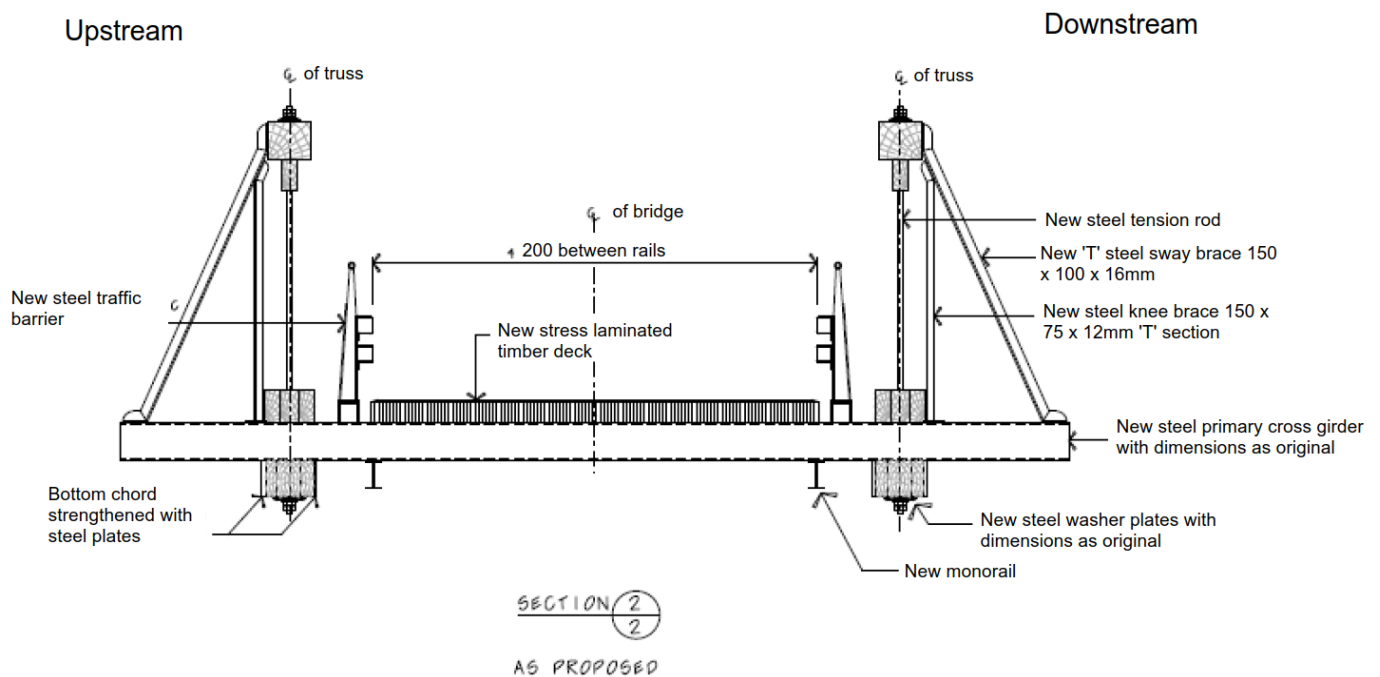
Typical cross section, proposed upgrade of McKanes Bridge
